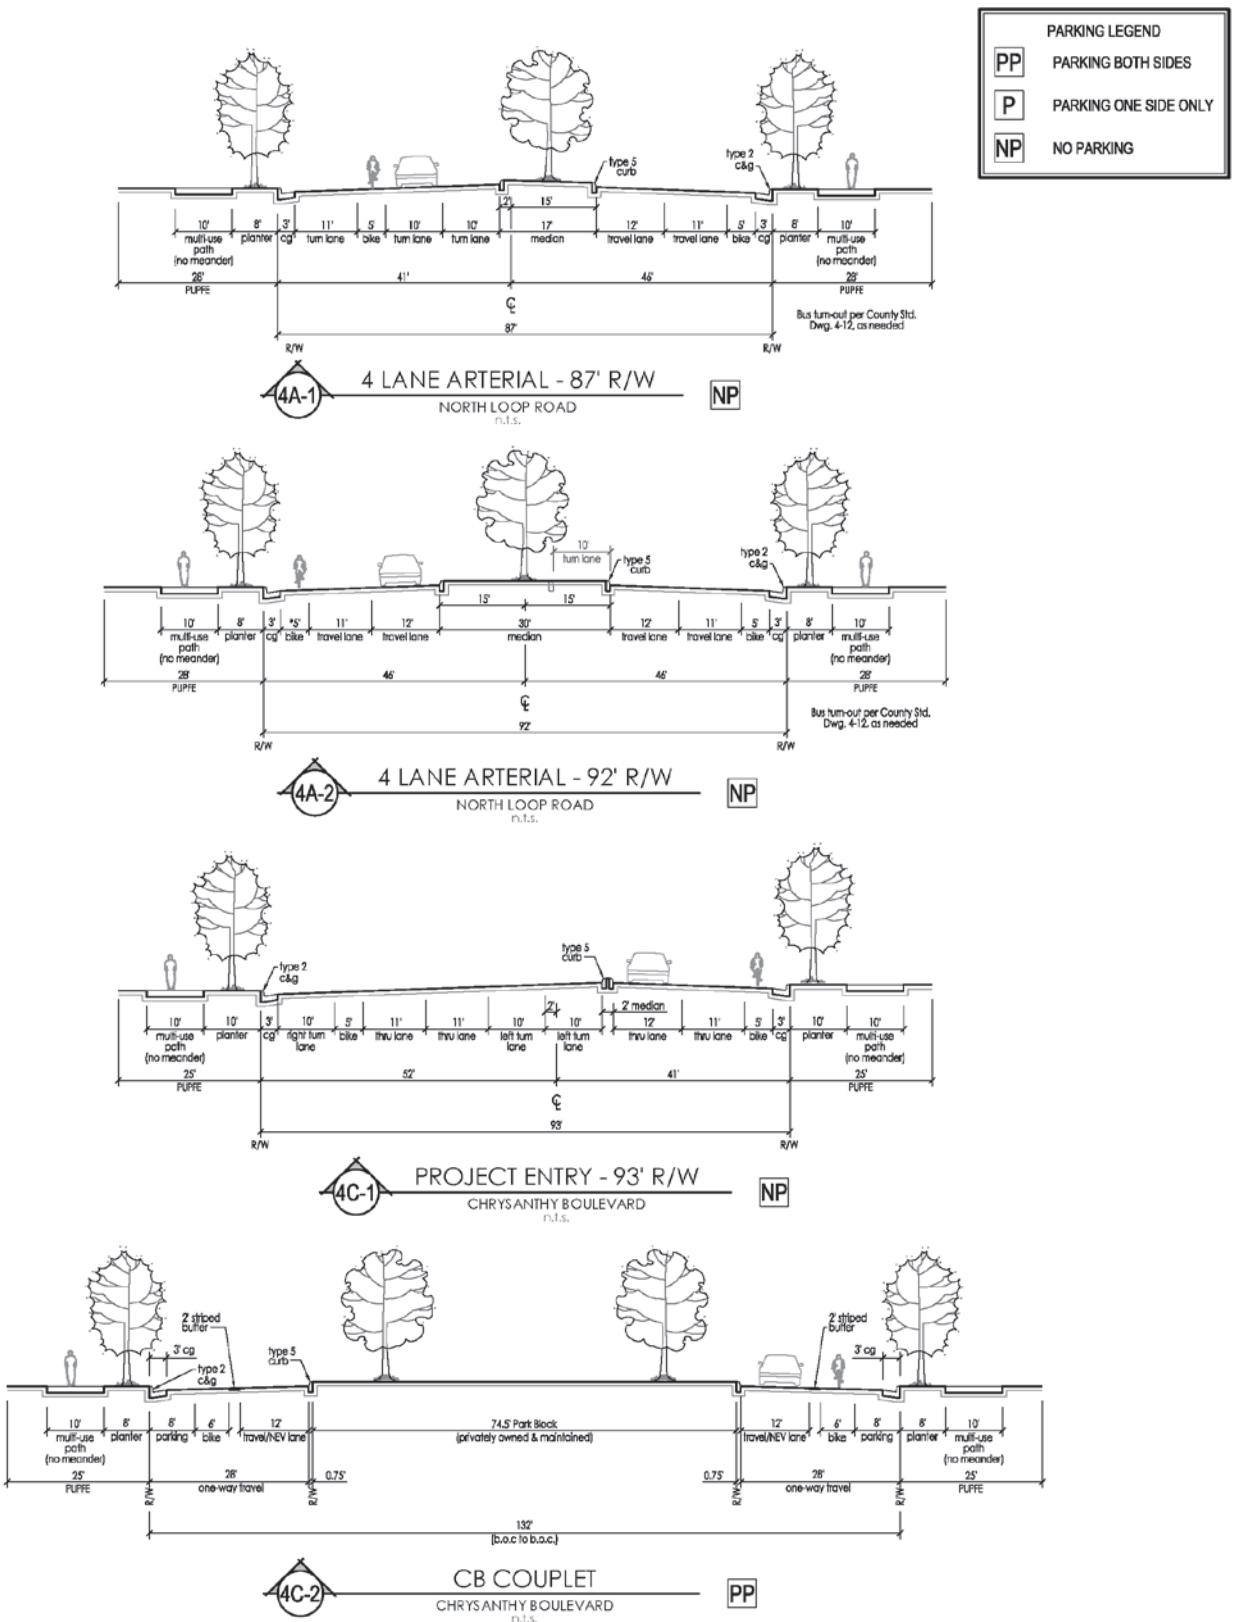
Street Sections (4A-1, 4A-2, 4C-1, 4C-2)
